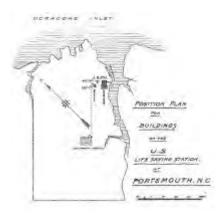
Plan for the first buildings of the Life-Saving Station, 1894.
